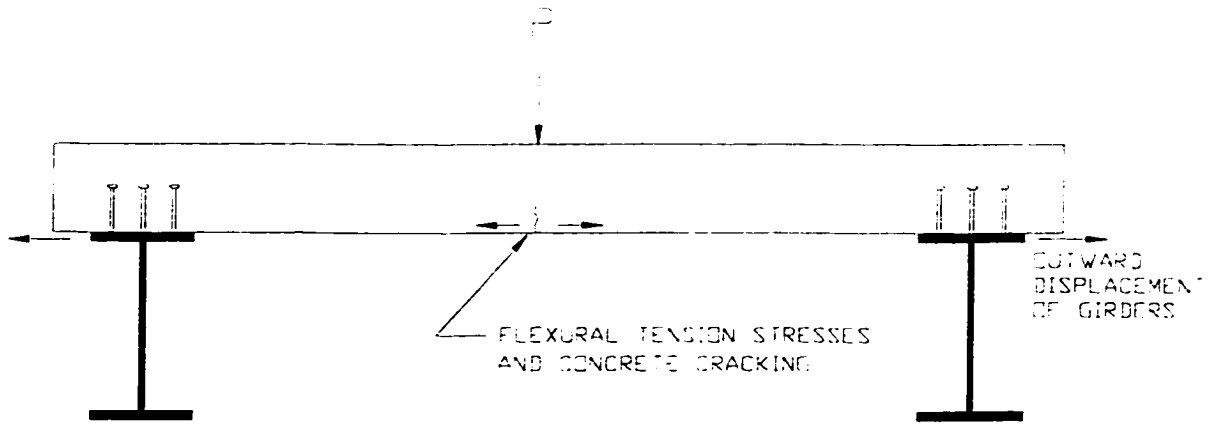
Cross-section of a typical bridge deck slab in flexure
